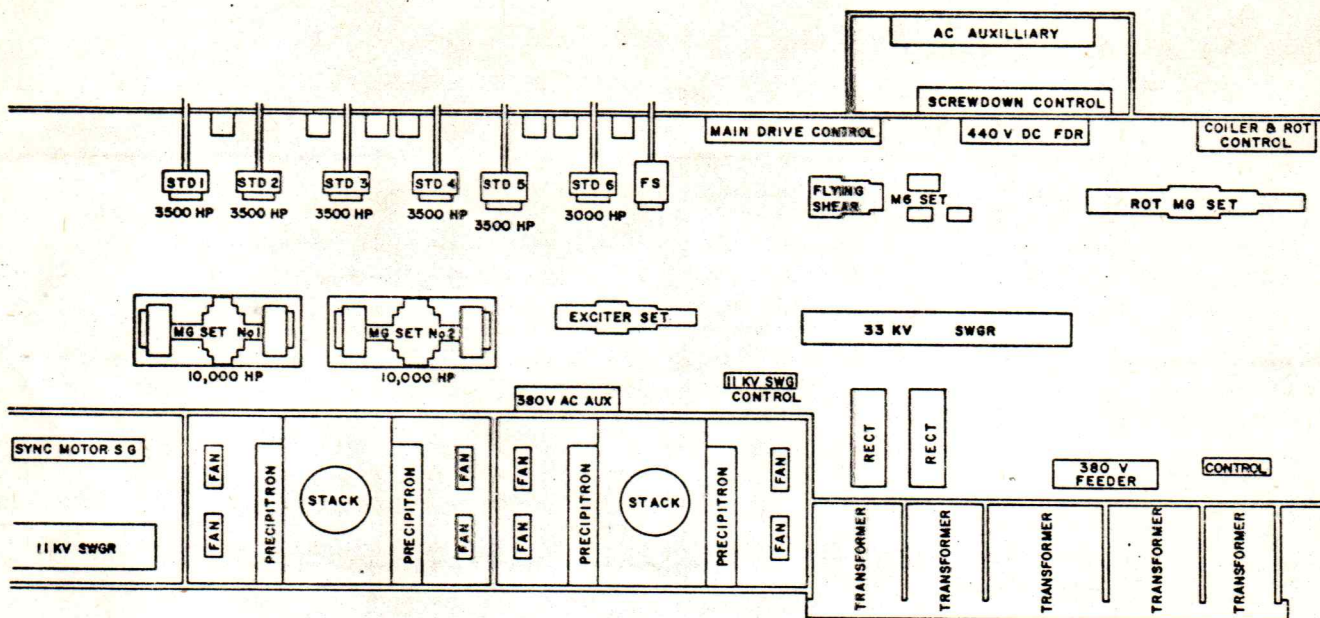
Layout of the old 56-in. hot strip finishing mill motor room.
